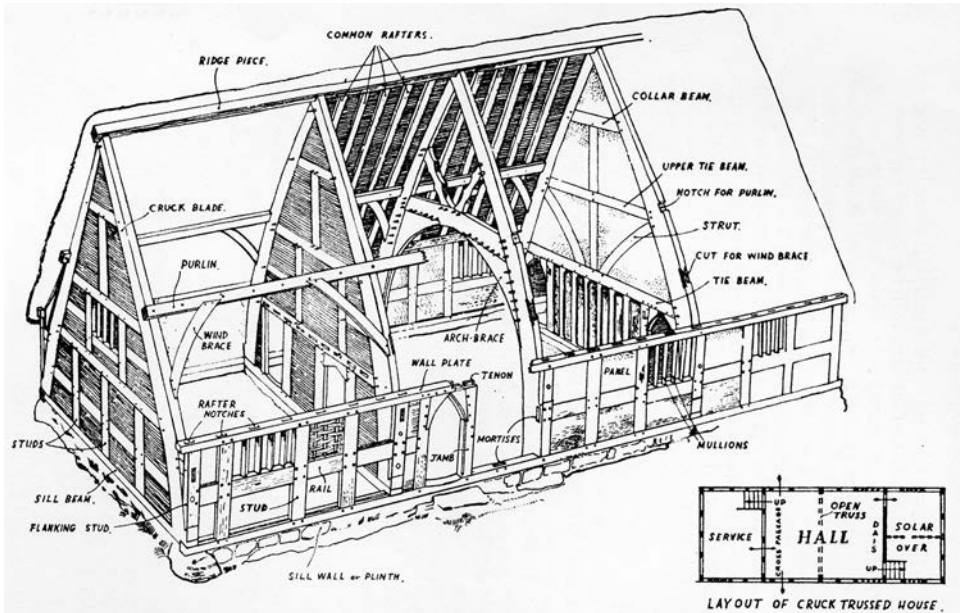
Reconstruction of a cruck-framed hall-house by Stanley Jones.
